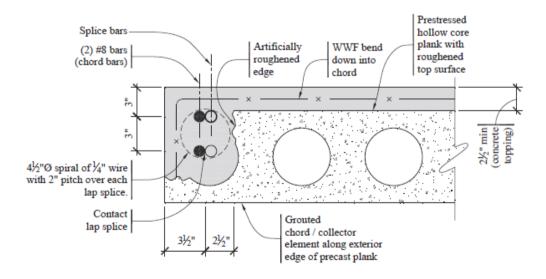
Example for detailing of precast floor showing reinforced topping slab and additional reinforcement for the chord and collector (FEMA P-751, 2012).
